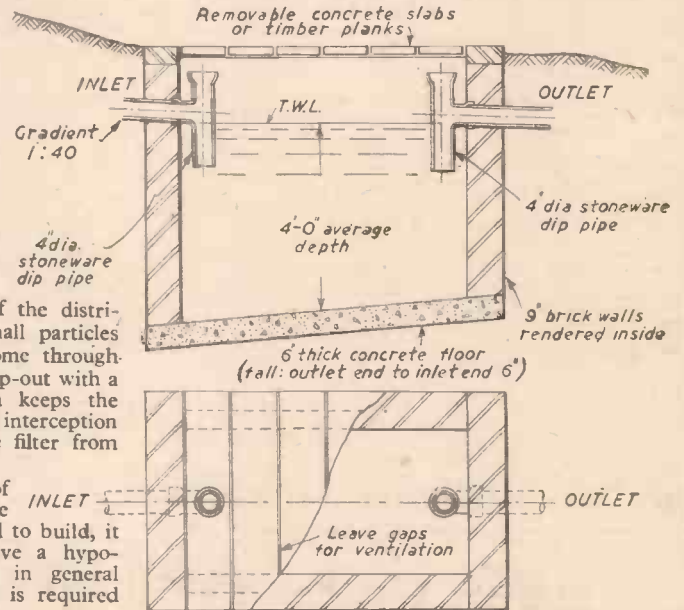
Section and plan of Mr. Averill's septic tank.
